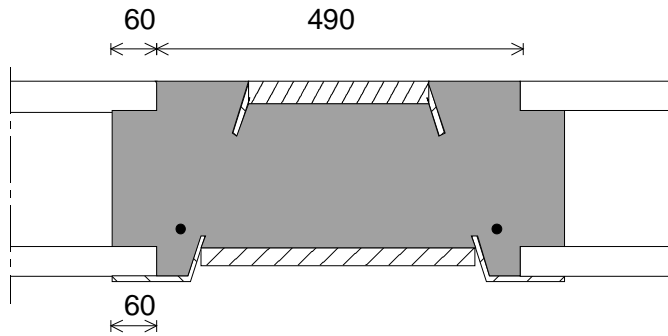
Cast-in-situ concrete within and outside middle beam. Note the tie bars T8.
